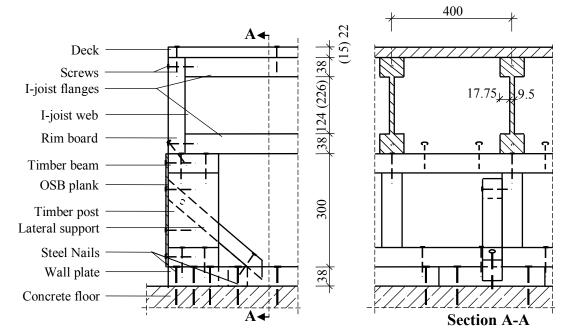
Details of support conditions of a floor supported along two sides, screw-fixed to the supports
